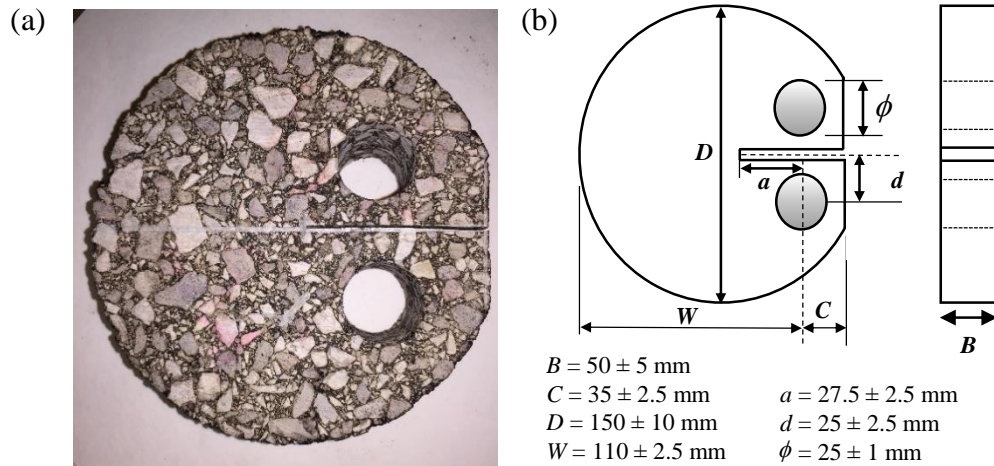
Disk-shaped compact tension (DCT) specimen (a) photo and (b) dimensions
